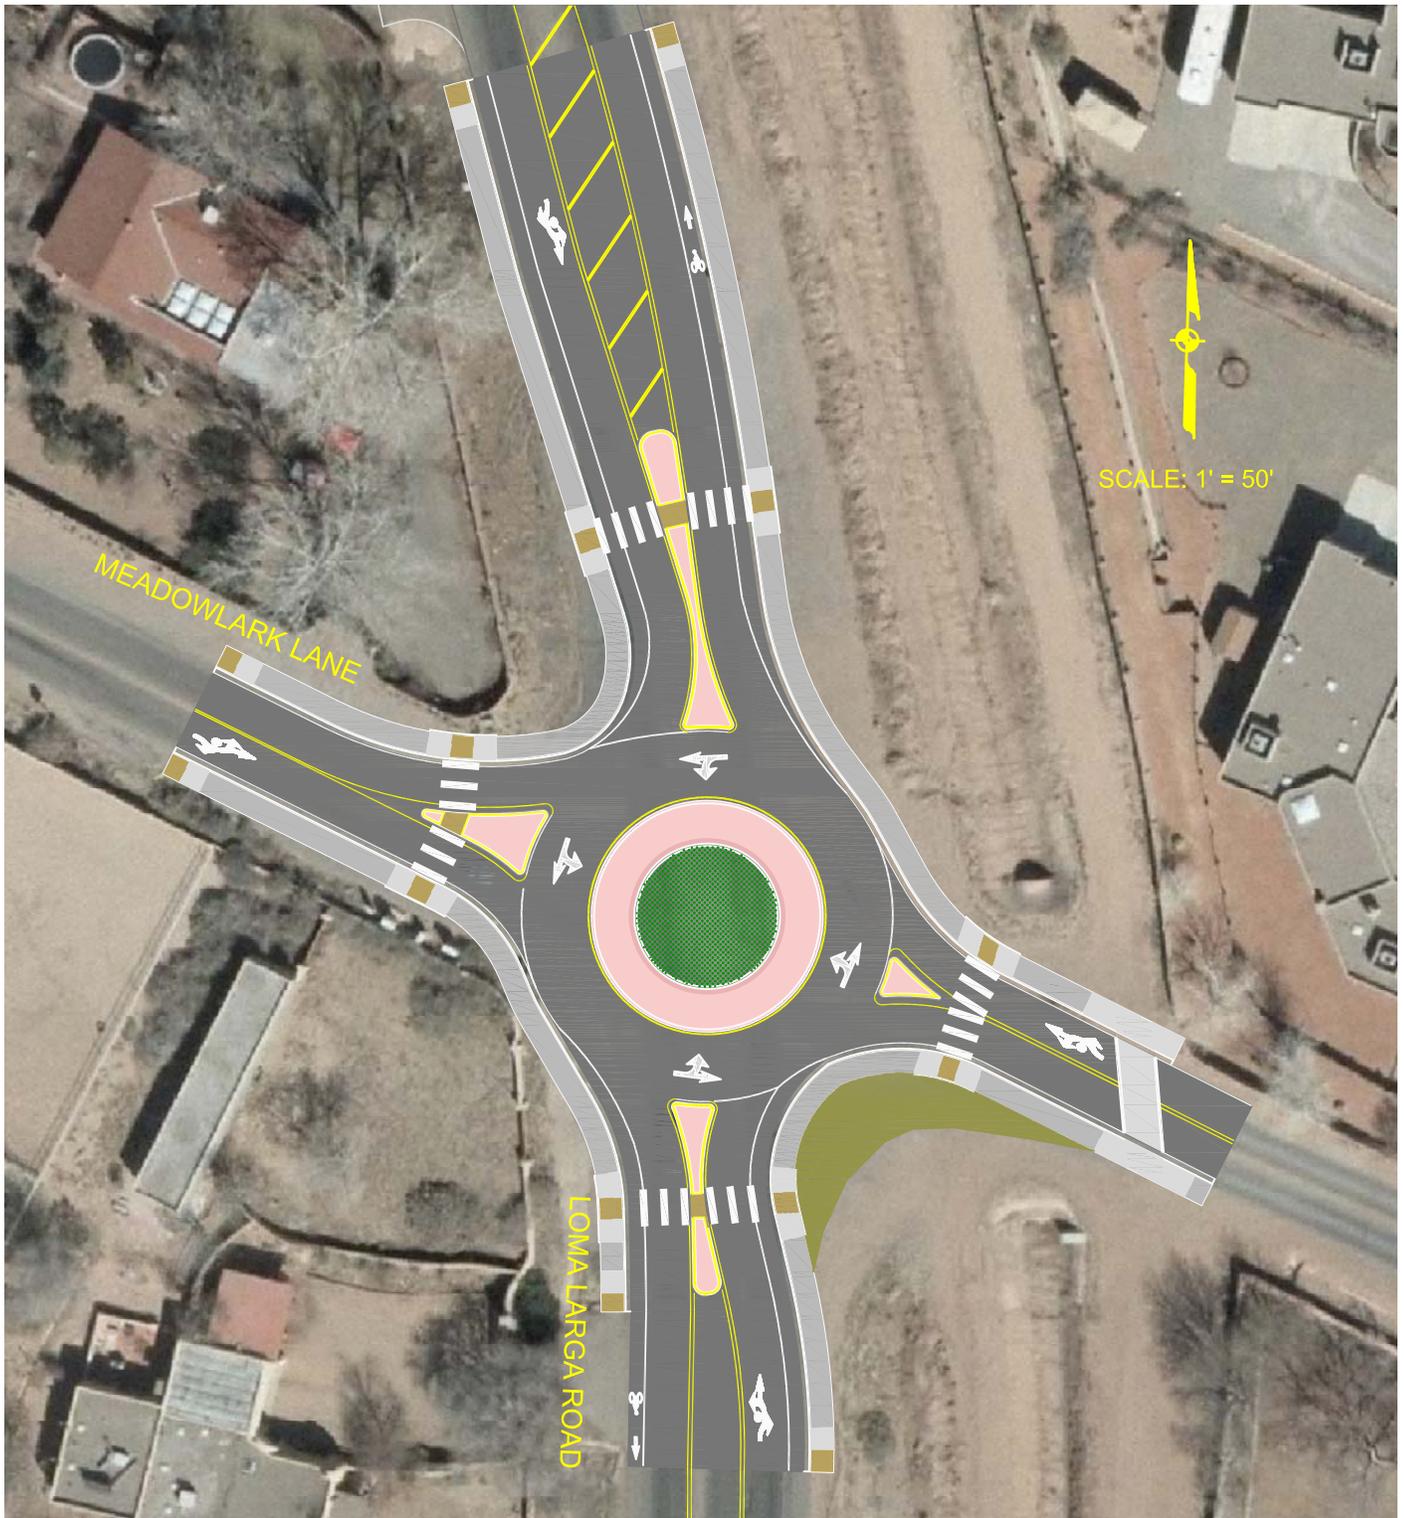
INSTALLATION OF ROUNDABOUT
